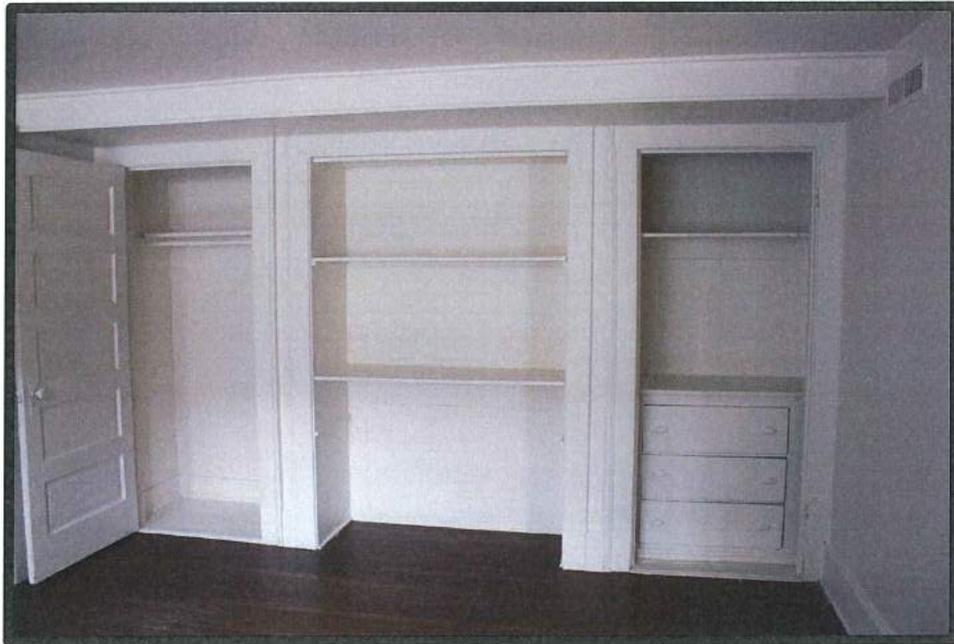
of 19: Unit interior closets and built-ins, basement level, camera facing E
